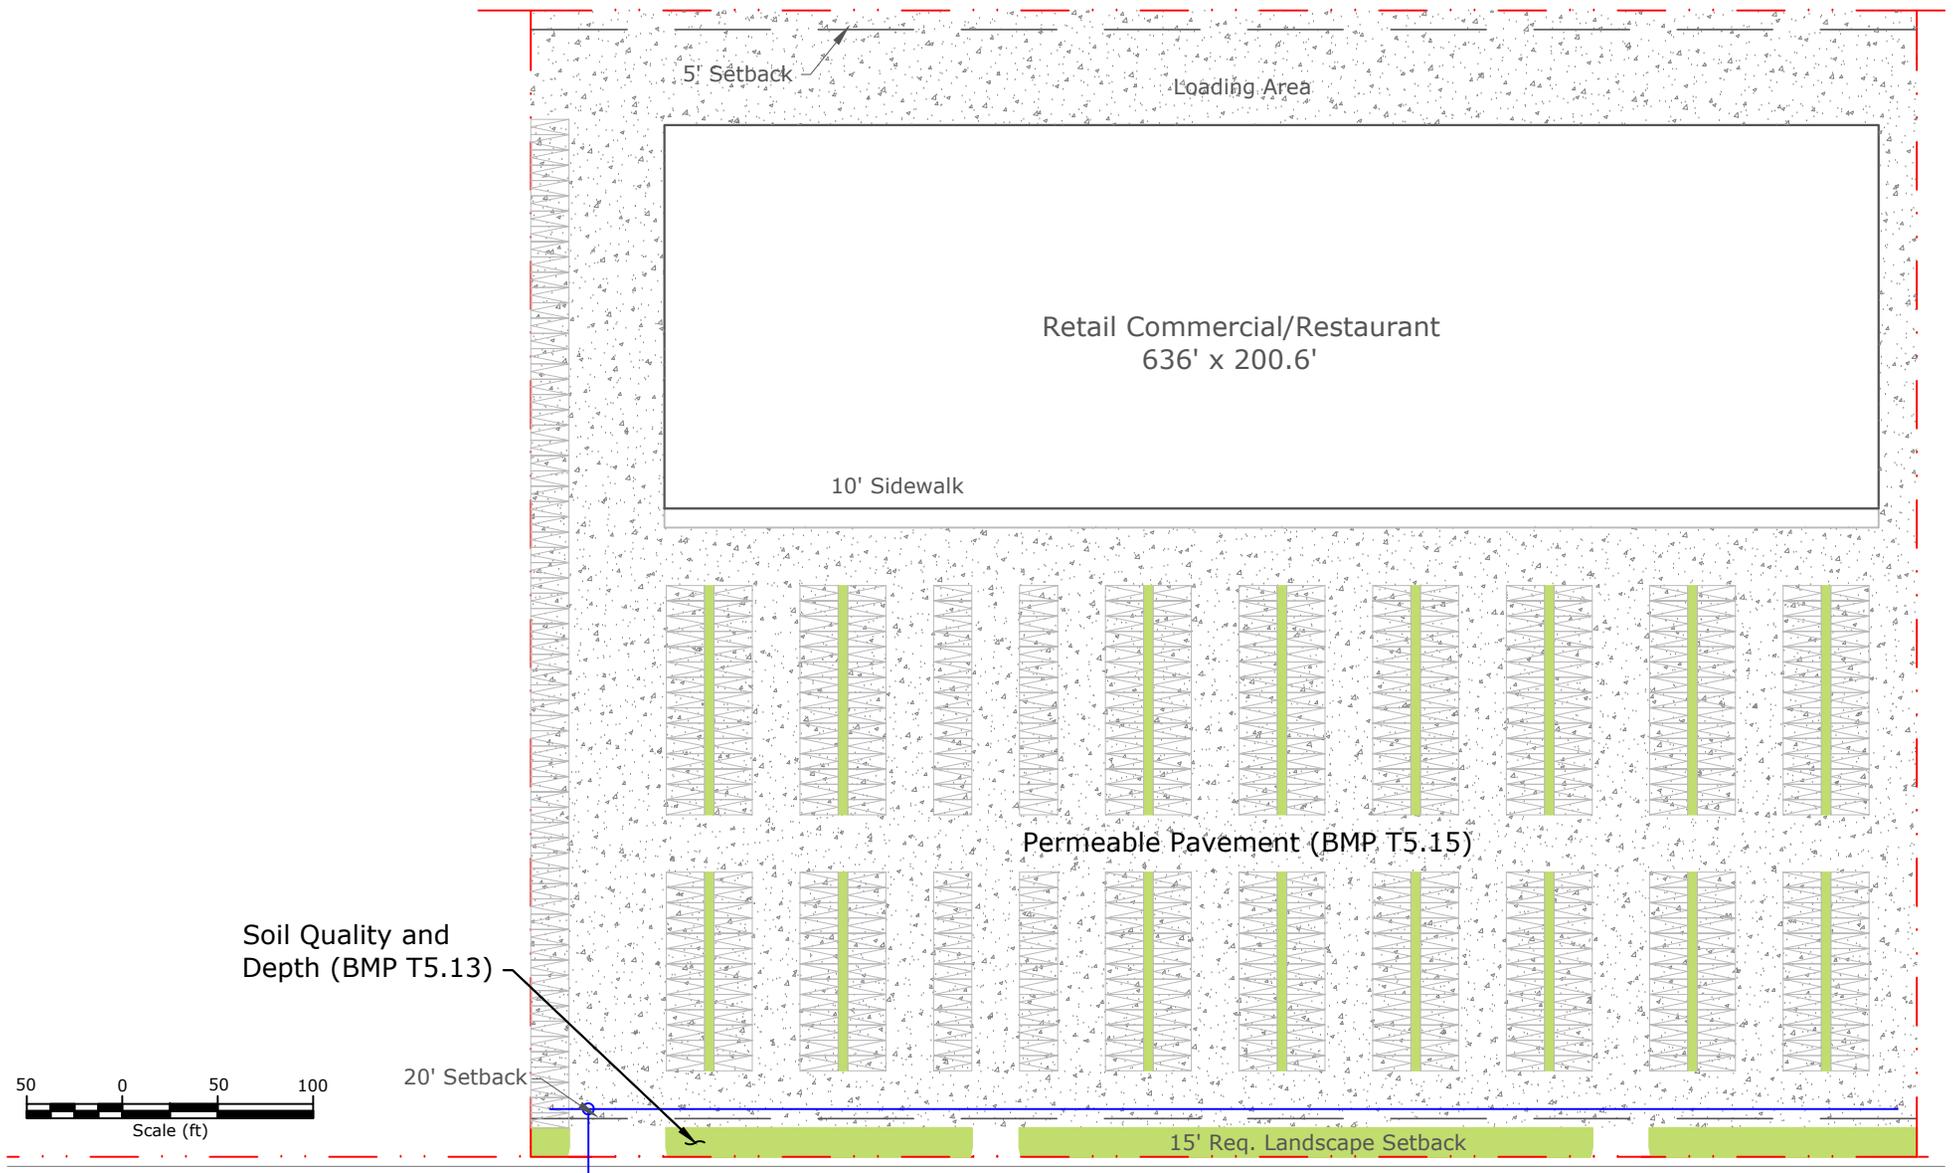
Scenario 14. Permanent Stormwater Site Plan – Large Commercial Development, 2012 Requirements, Till Soils
